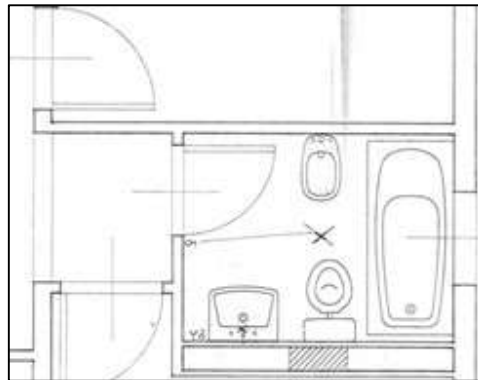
Toilet-LAYOUT F (F108.4T9).
